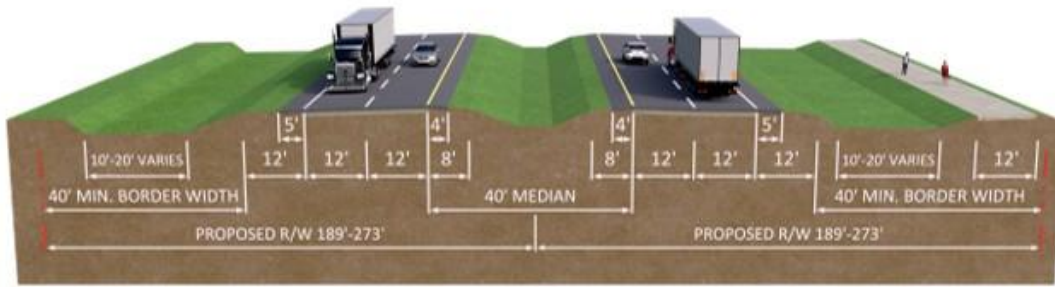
Preferred Alternative Roadway Typical Section: East of Indian Prairie Canal C-40 to C.R. 721 (End Project)
